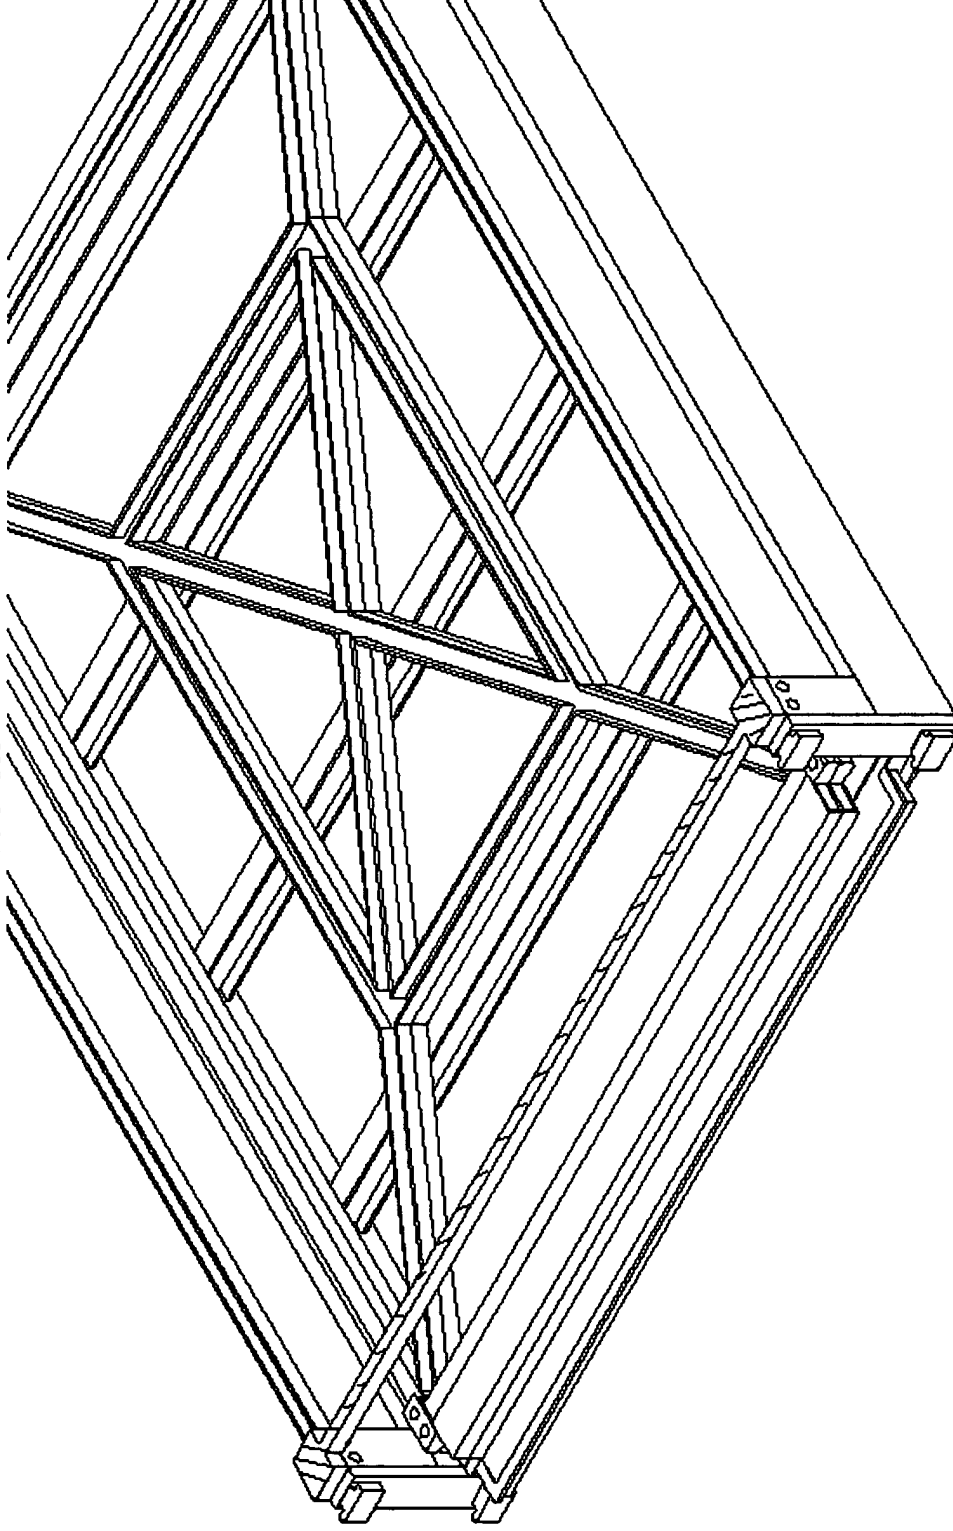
B: Enlarged view based on FIG. 39B to show the base part position indicated by shaded lines
